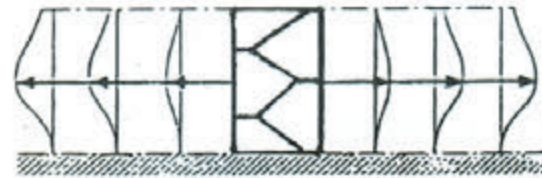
Effect of central stairwell on surrounding columns (no expansion joint) (*fib*, 2010)
